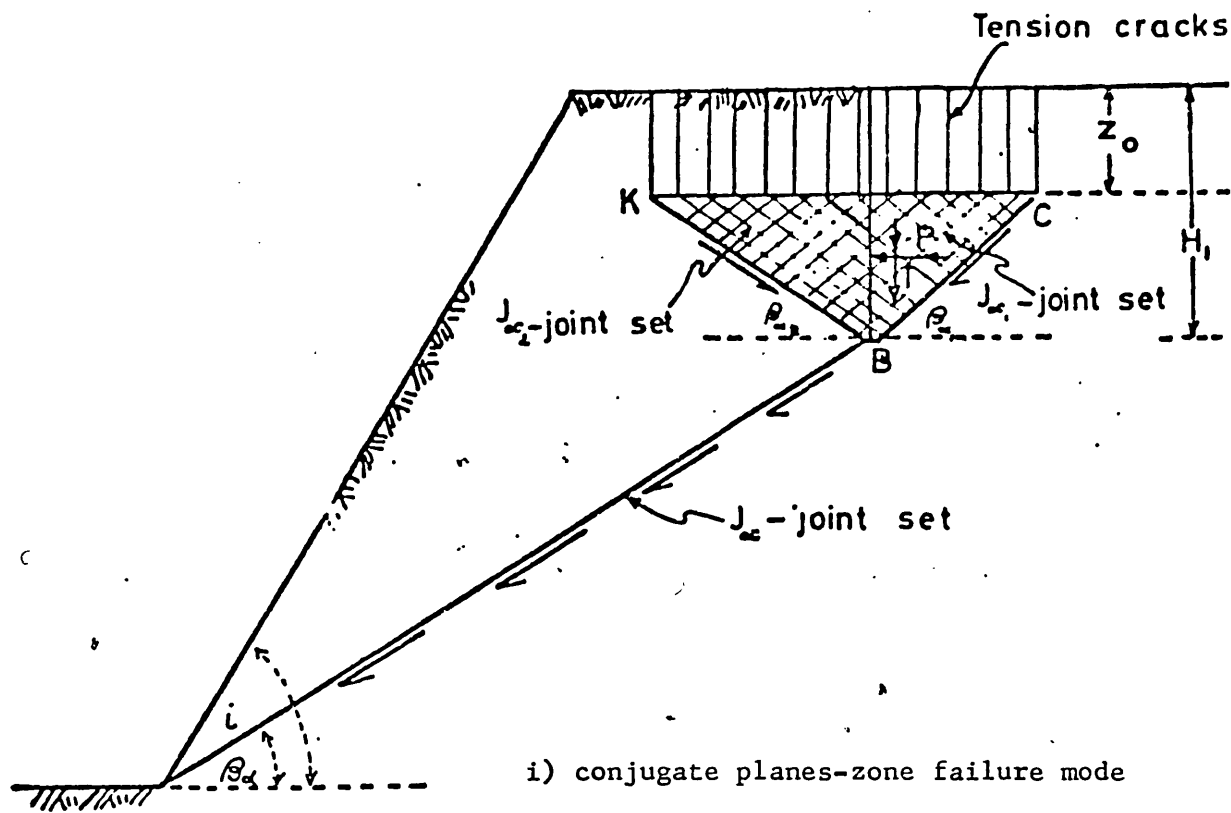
Conjugate planes-failure modes (After Piteau³⁹);
